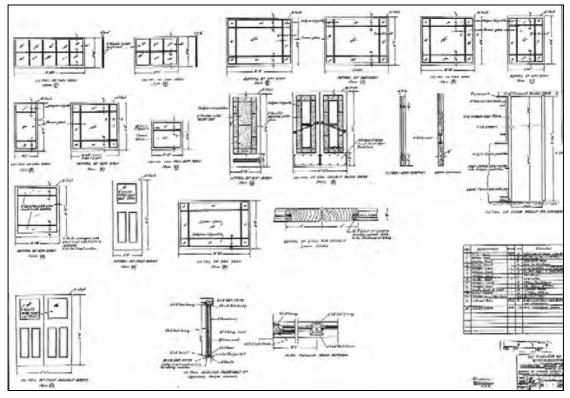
Details of doors and windows in second floor offices of power station (HEC plans - A5489).
